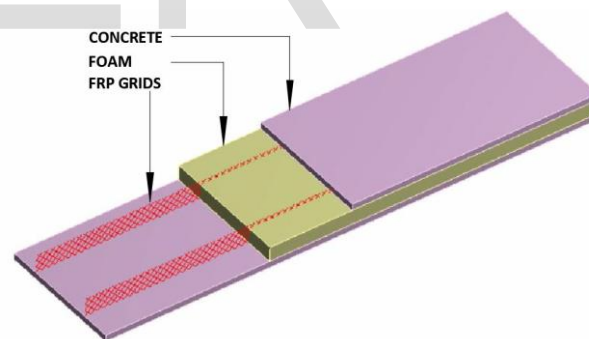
Precast concrete sandwich panel with FRP shear grid and foam
